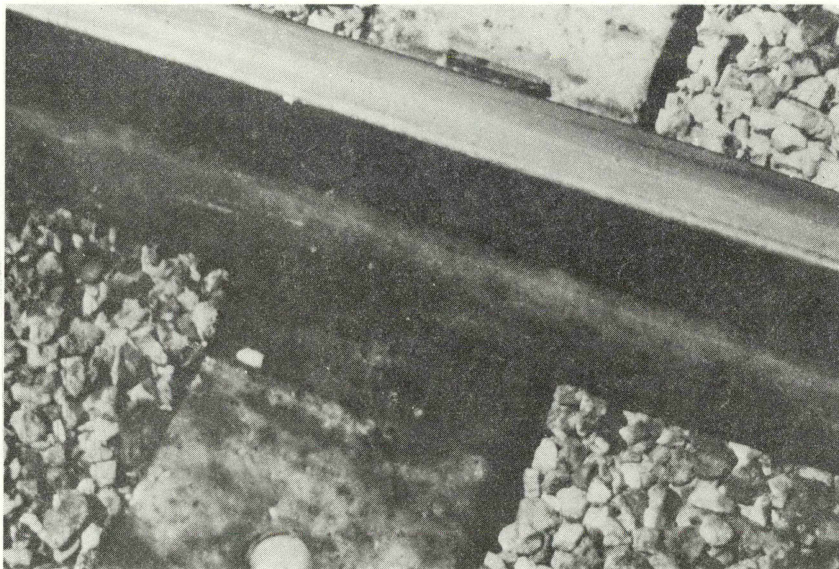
Bolt Failure - showing some rail pad distortion (1)
